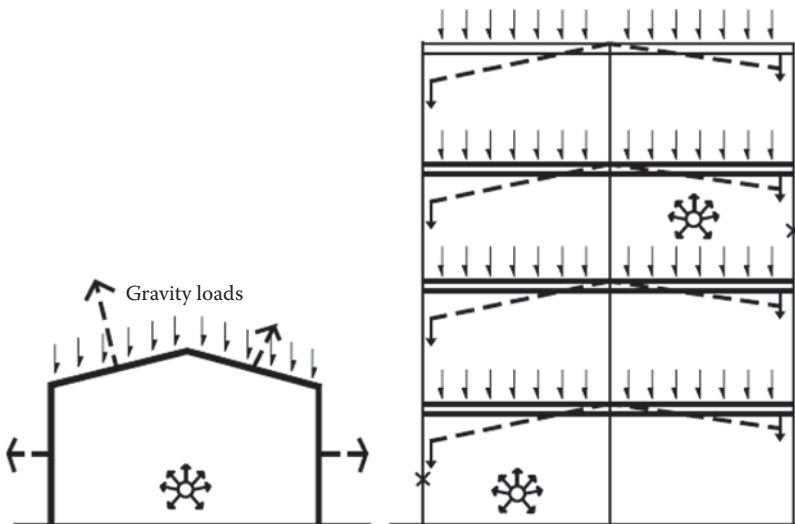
Interior explosion: when explosions occur within structures, pressures can build up within confined spaces, causing lightly attached wall, floor, and roof surfaces to be blown away.
